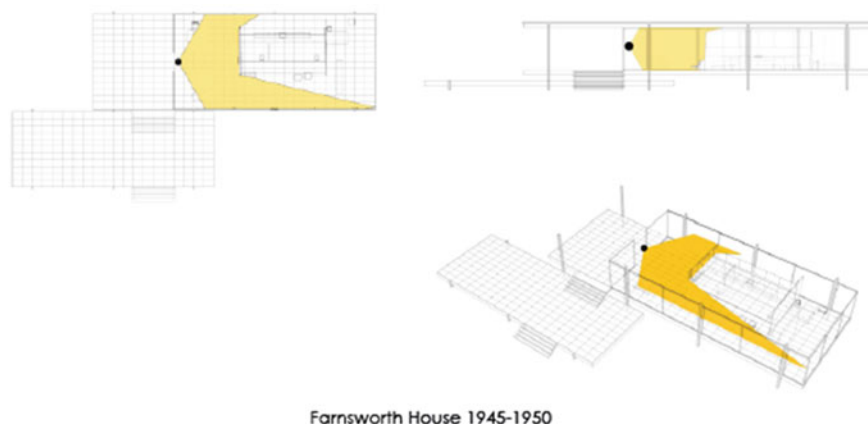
Farnsworth House, Mies van der Rohe, (clockwise) isovists in plan, section and 3D
